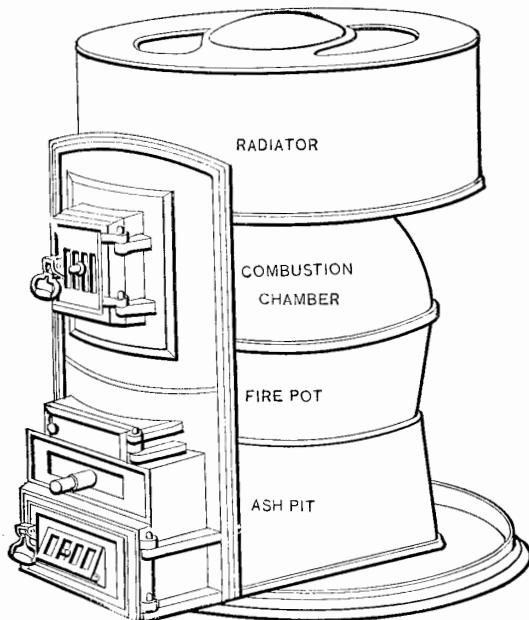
Direct Draft Furnace (Less Casing) with Steel Radiator.
